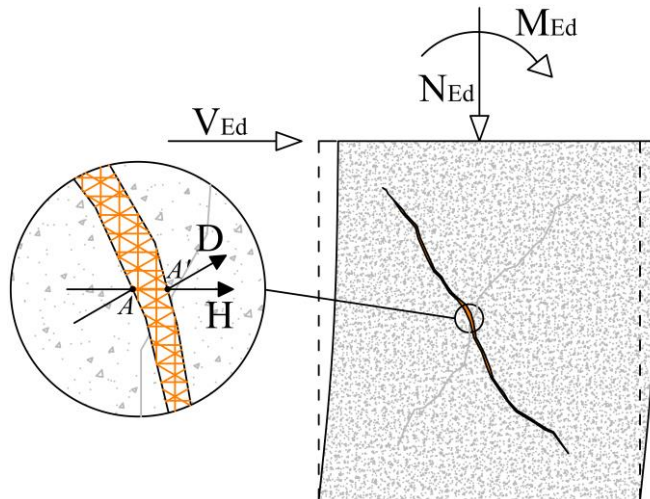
Diagonal cracking of a masonry pier strengthened with EQ-GRID
